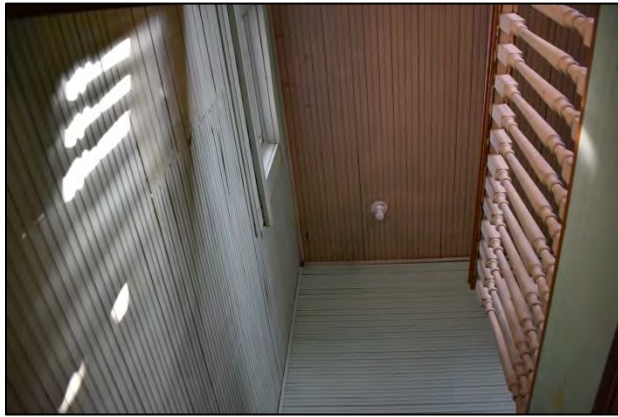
Stairs and beadboard looking up from first floor and from within upstairs hall
